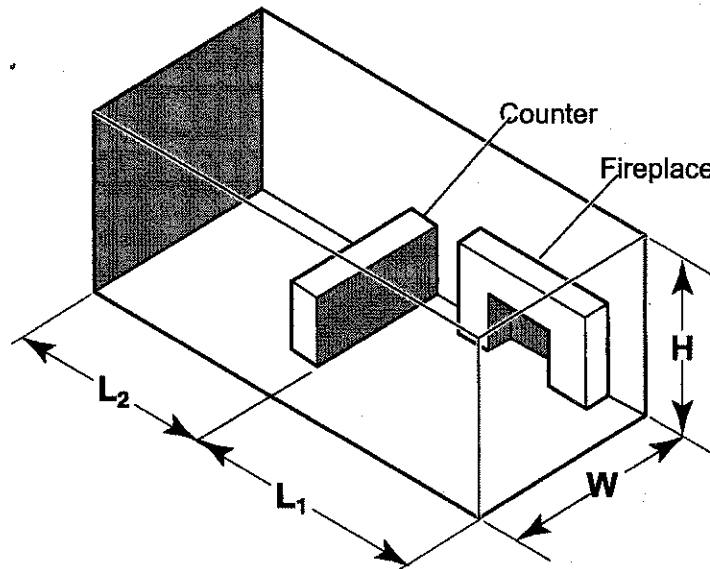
Example of a Large Room with 1/2 Wall Divider
